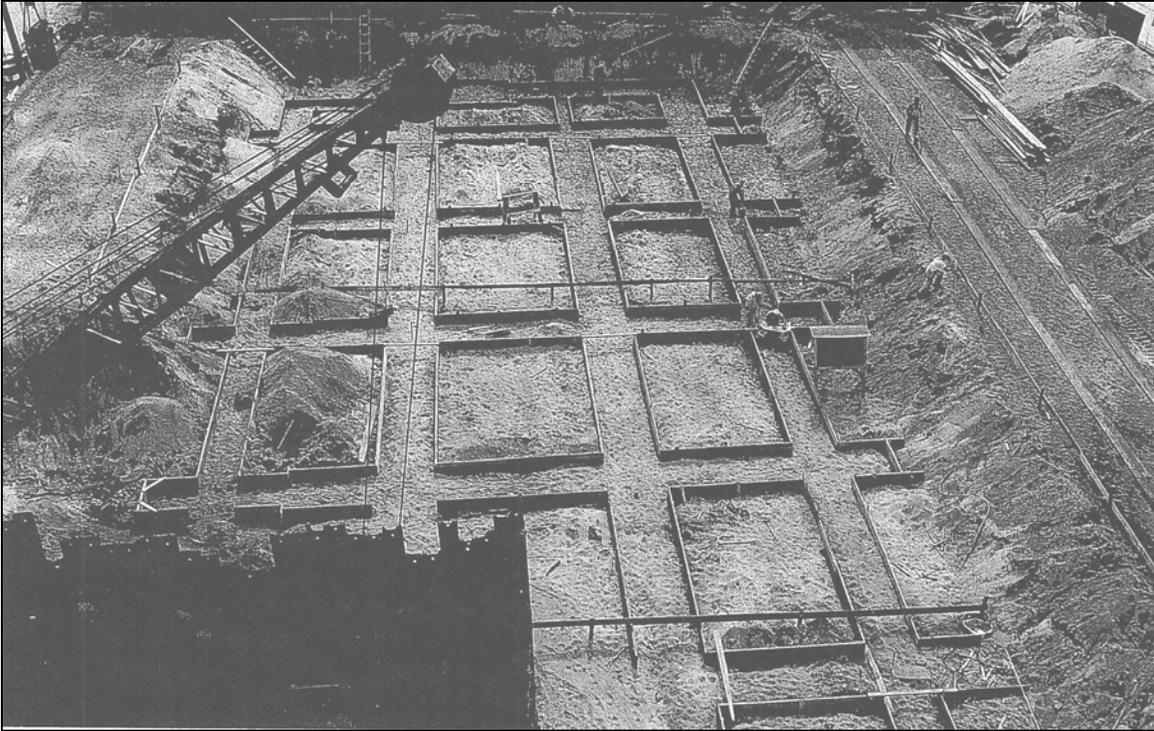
View of Diamond Head Tower basement excavation in 1950 (Kalākaua Ave. at left, seawall at right; note workers for scale and slope of excavation walls)
